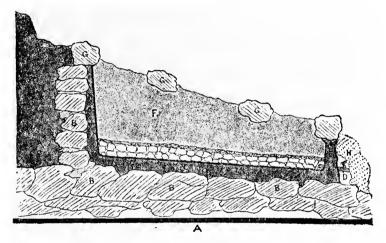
Sectional Plan showing Construction of a Small Moraine,
